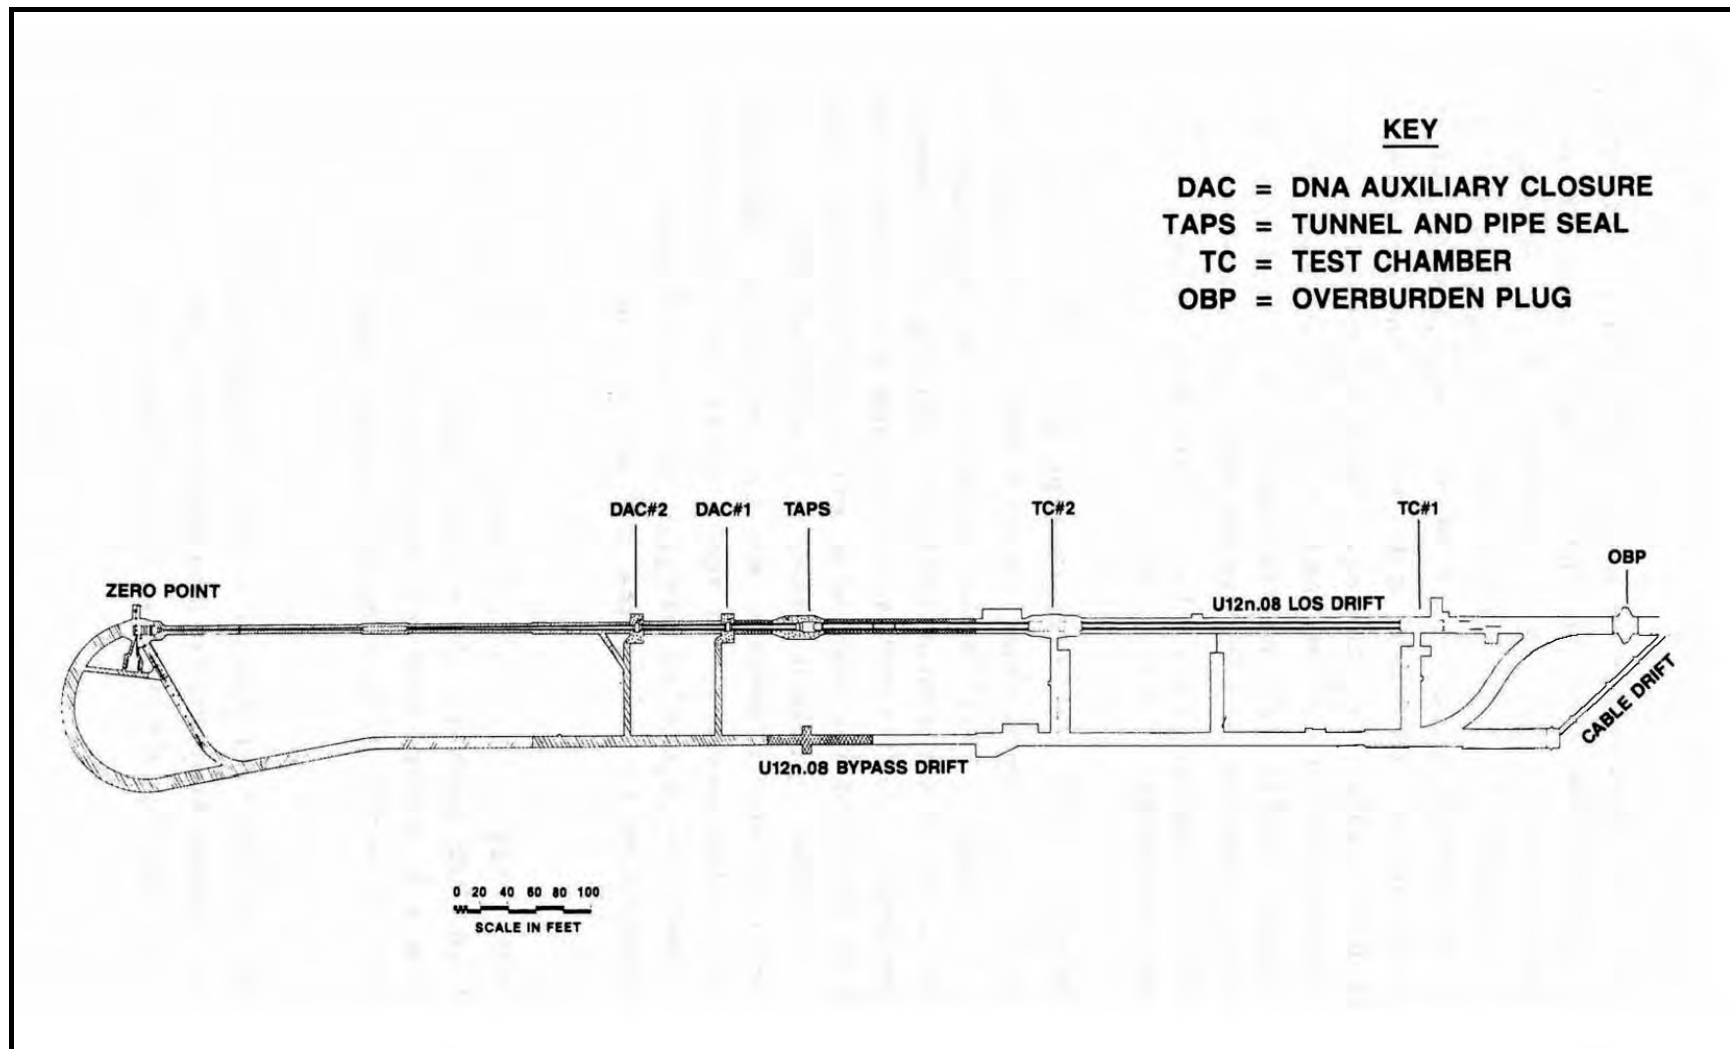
Plan of the U12n.08 drift for the Ming Blade test (McDowell et al. 1987:187).
